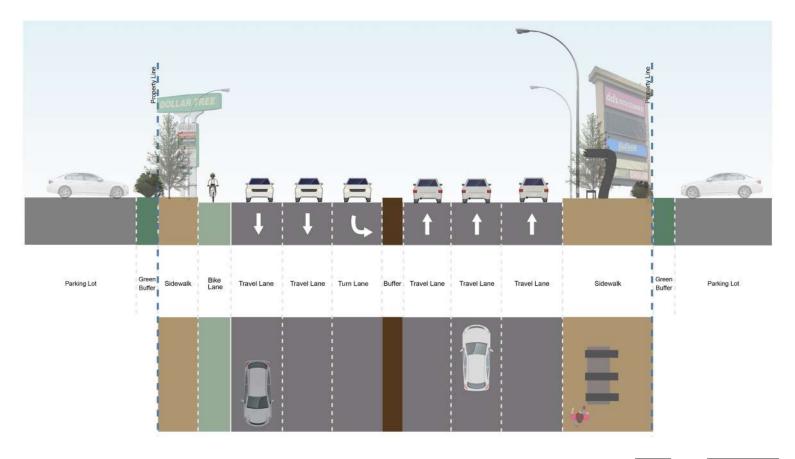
Existing Street Section - E. Kings Canyon Rd. @ S.Clovis Ave.
